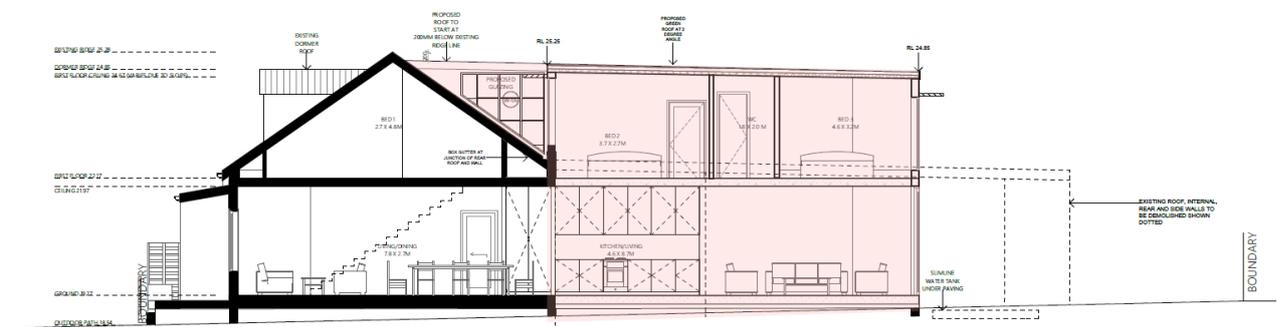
Proposed Section Plan (extent of new works outlined in red)
